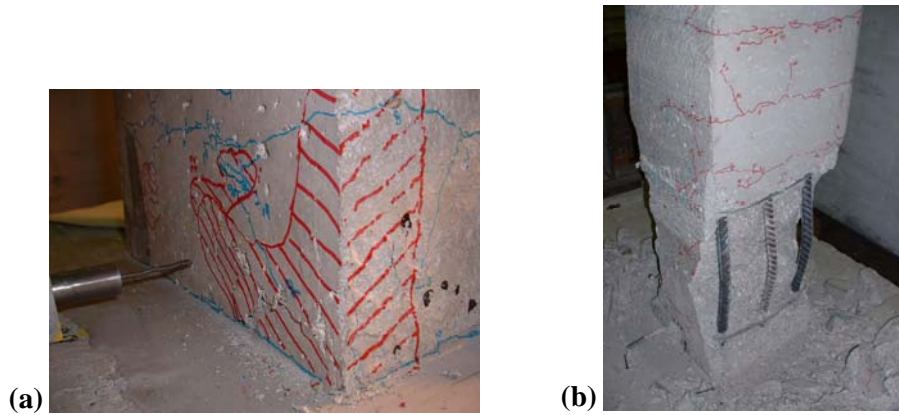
(a) Spall initiation at southwest corner, (b) Column 1 after testing
